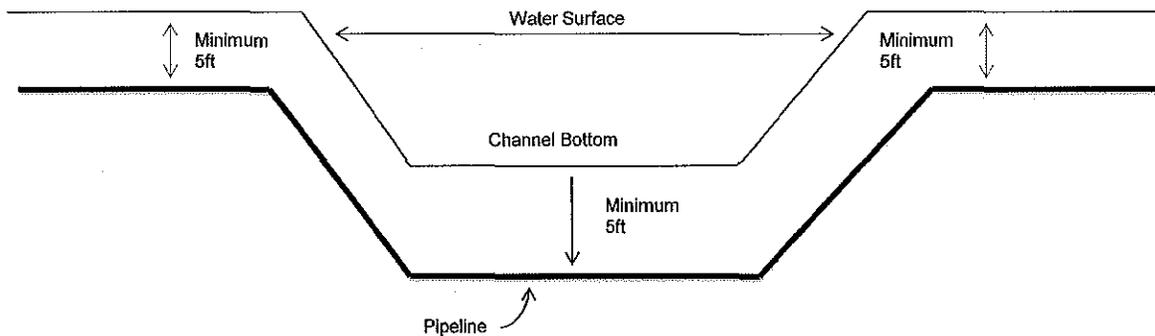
Typical schematic for Private Channels and Open Bays demonstrating pipeline placement requirements.
